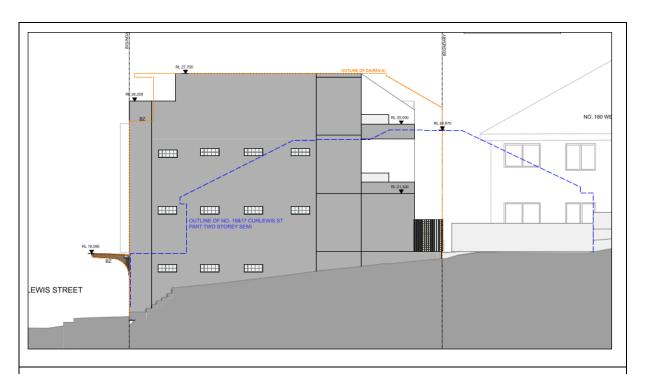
(above): West elevation of refused architectural plans in DA-320/2018 (Source: applicant)
